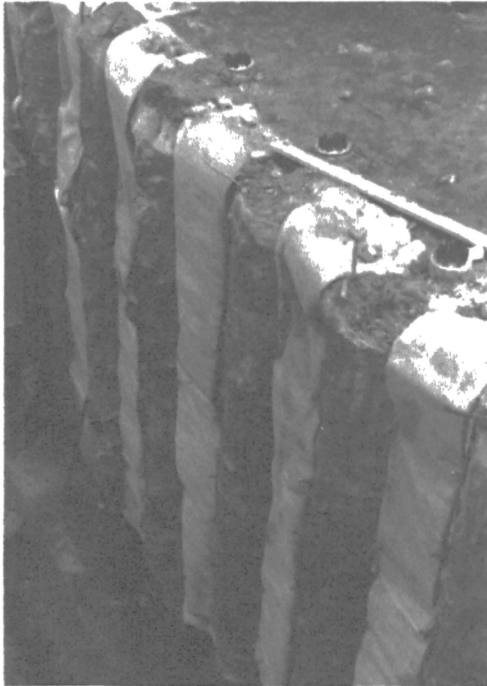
CAISSONS AND DRAINAGE BOARD
